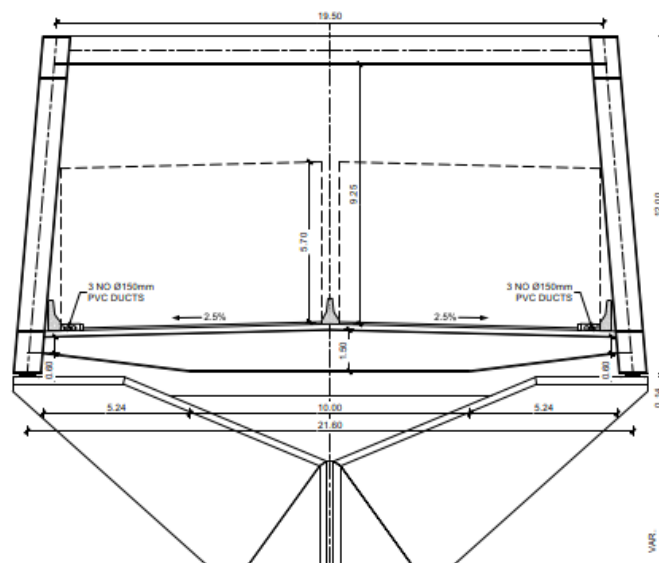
Typical cross section of the 200m span trusses for Chilmari-Rowmari.
